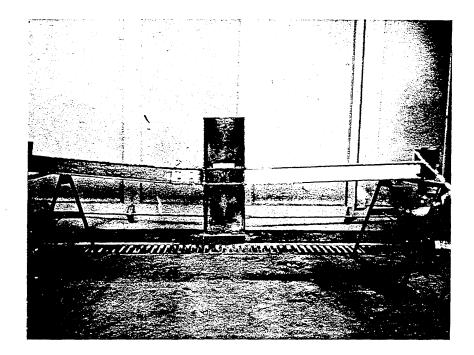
b. Plan View of Specimen 40 S 4 M 13.0
